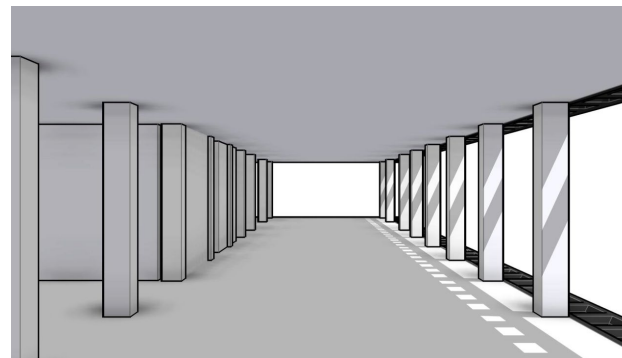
Modeling of typical floor on the fall and spring solstices (by Author)
